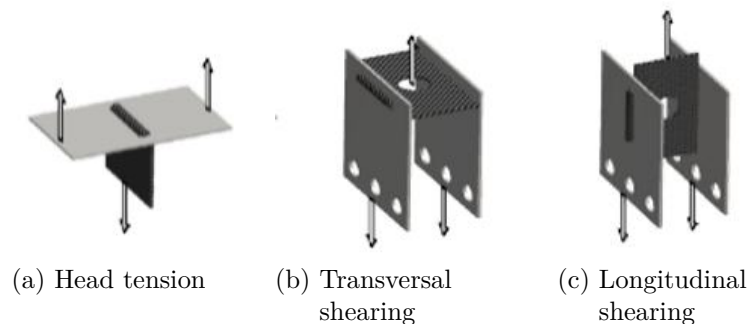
Loading types for the experimental characterization of the bridge-deck-panel joints [139]
